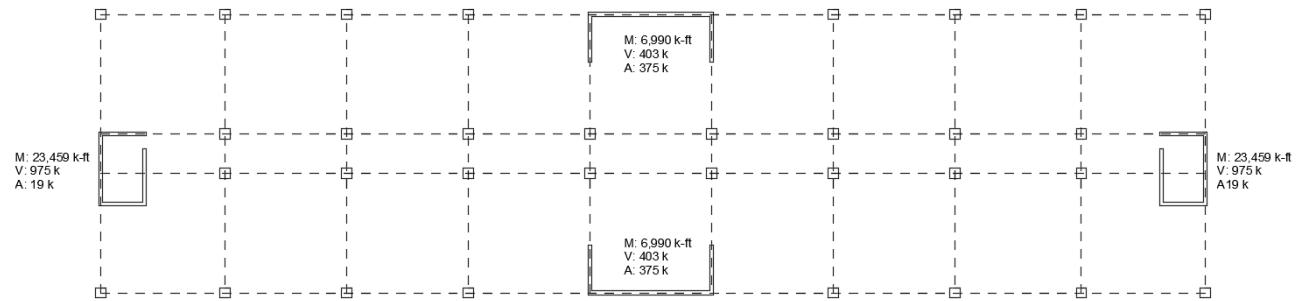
ETABS output of axial load, shear force and bending moment at the base of each structural wall 4th floor
